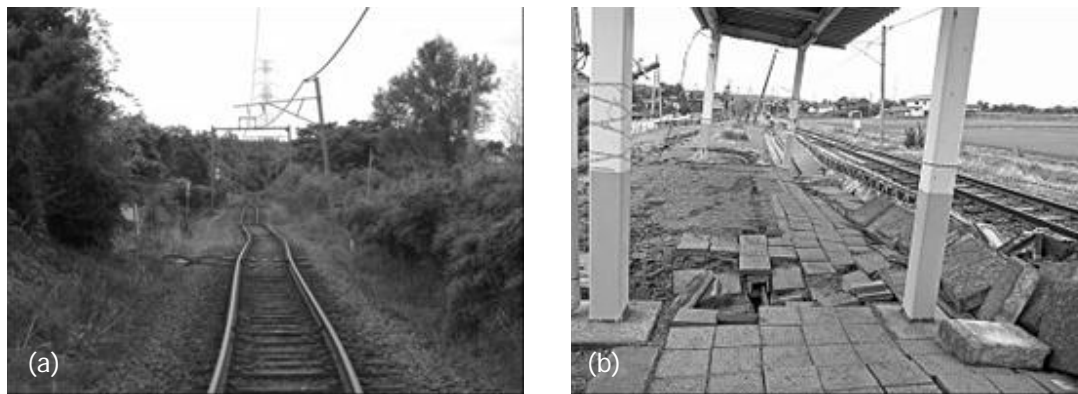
Damage to railway facilities: (a) buckled railway track; and (b) damaged platform of Arahama train station.
